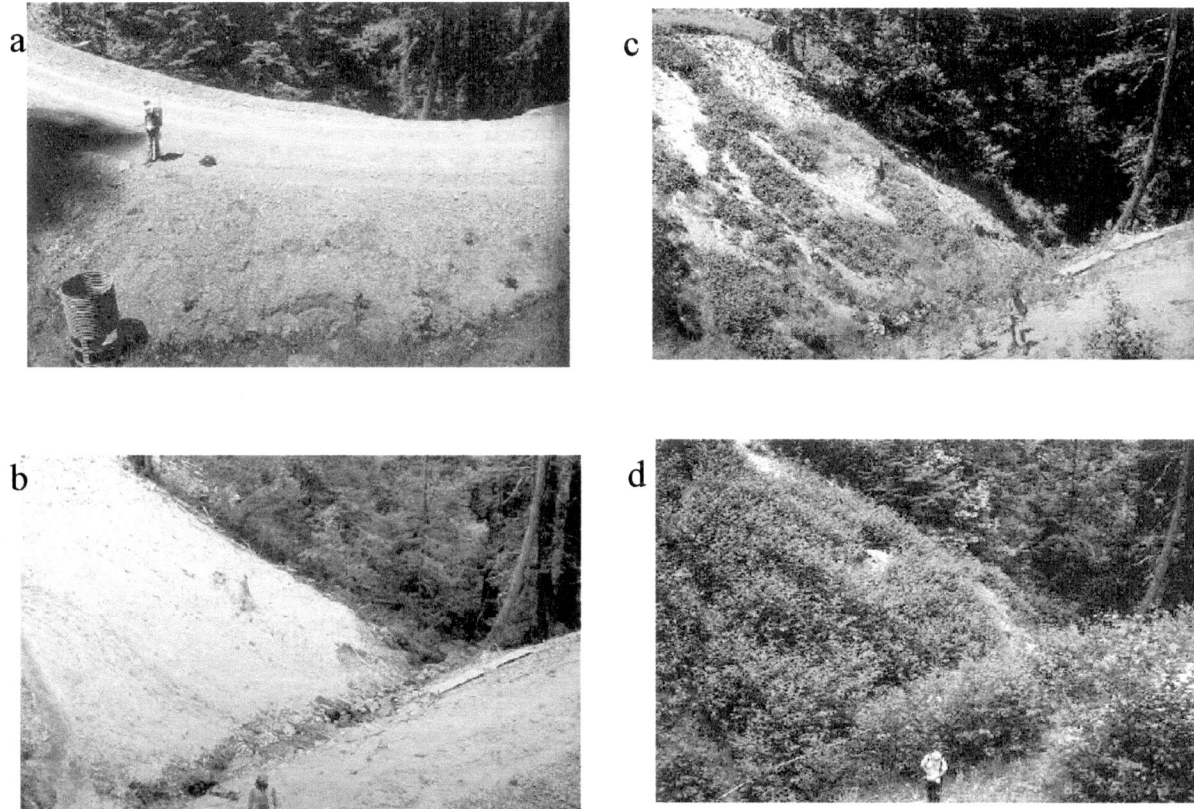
Typical stream channel excavation. a) Abandoned logging road with intact culvert before treatment. b) Immediately following stream crossing excavation. Note artificial rock armor placed on channel bed. c) Less than one year later, revegetation of the streambanks is well underway. d) Three years after treatment, alders have revegetated most of the ground disturbed during treatment.
